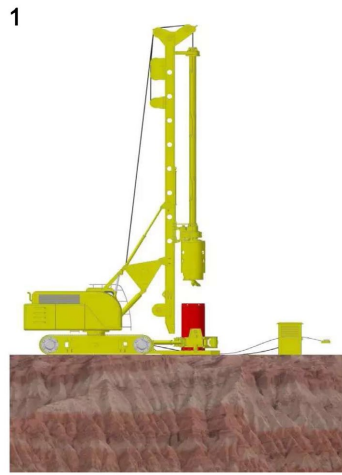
Connection between the rotary drilling rig and the pipe ramming machine
